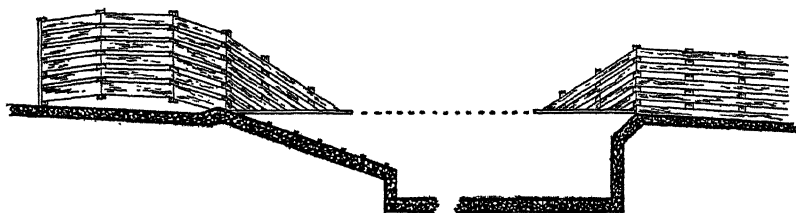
Section of large concrete dipping tank. (After Imes.)
